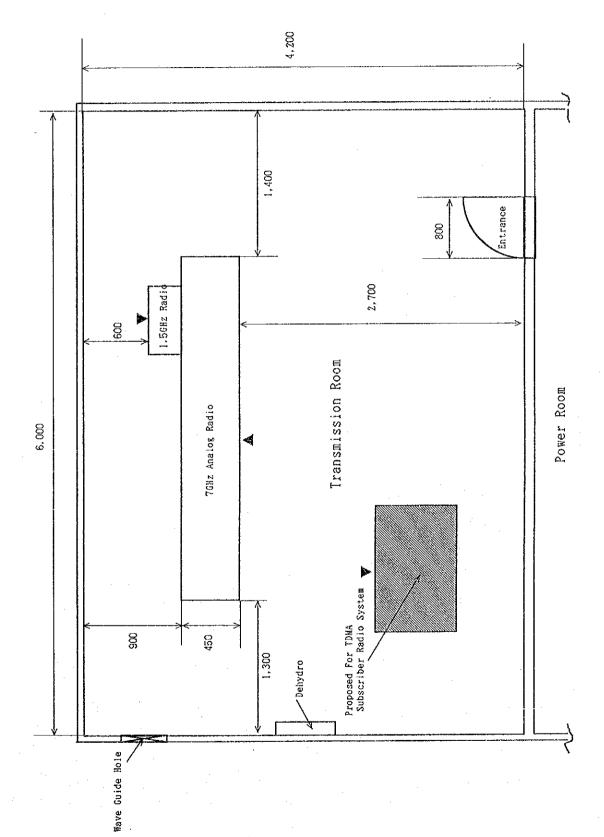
Equipment Layout Plan for MLIBA Repeater Station
